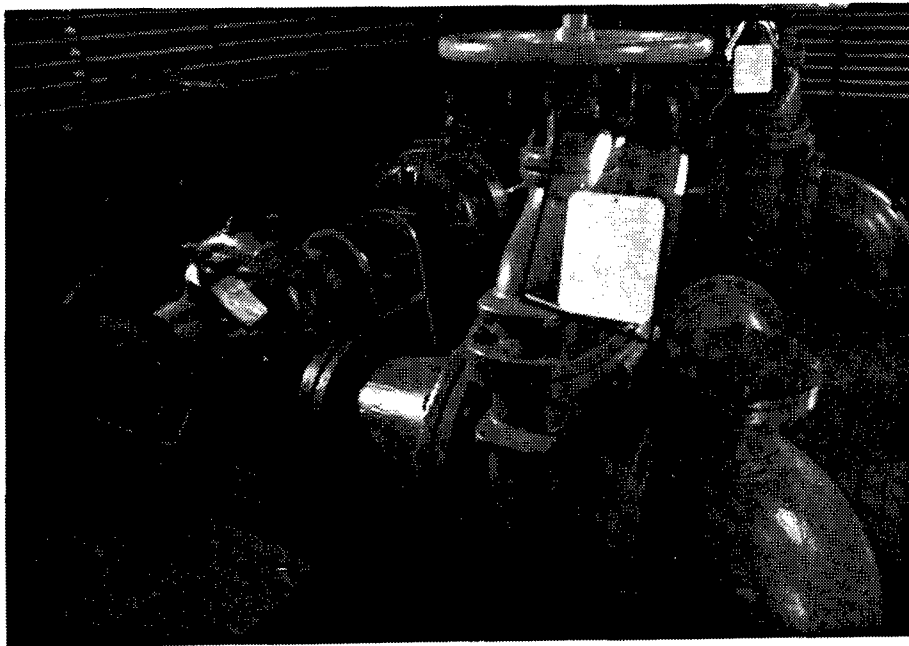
Building 1521A: Ingersoll-Rand chilled water circulating pump and motor.
